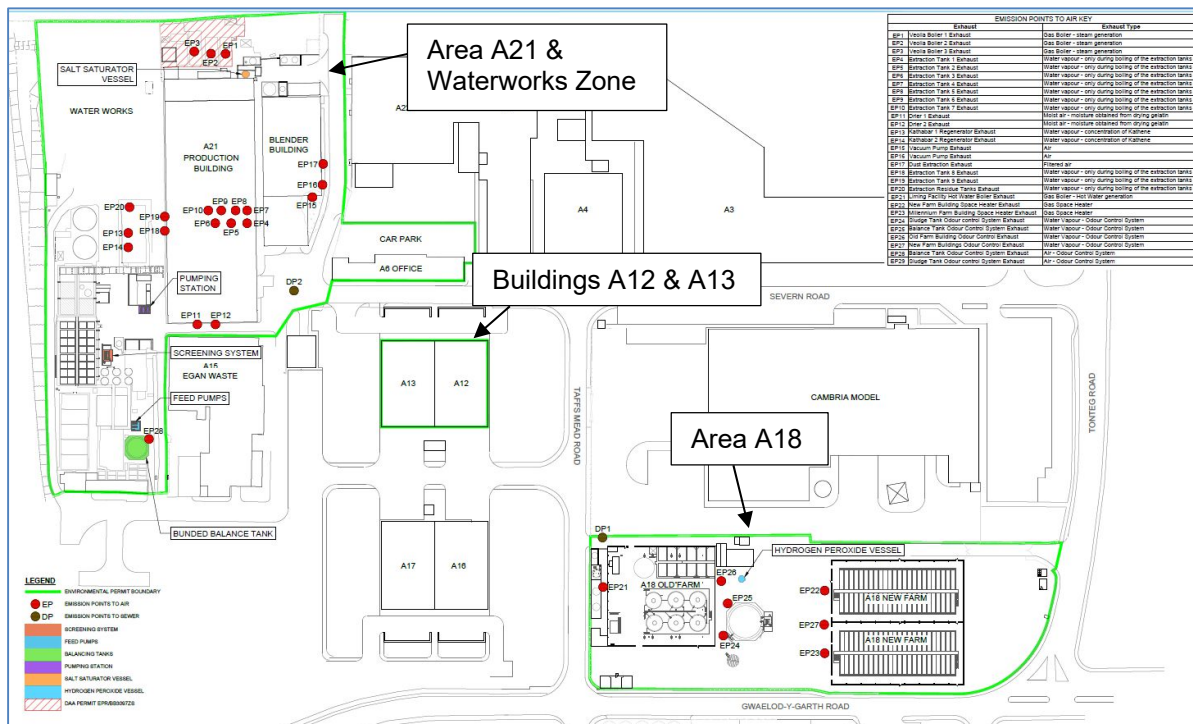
Installation Layout Plan (extracted from 2025 Site Closure Plan)
